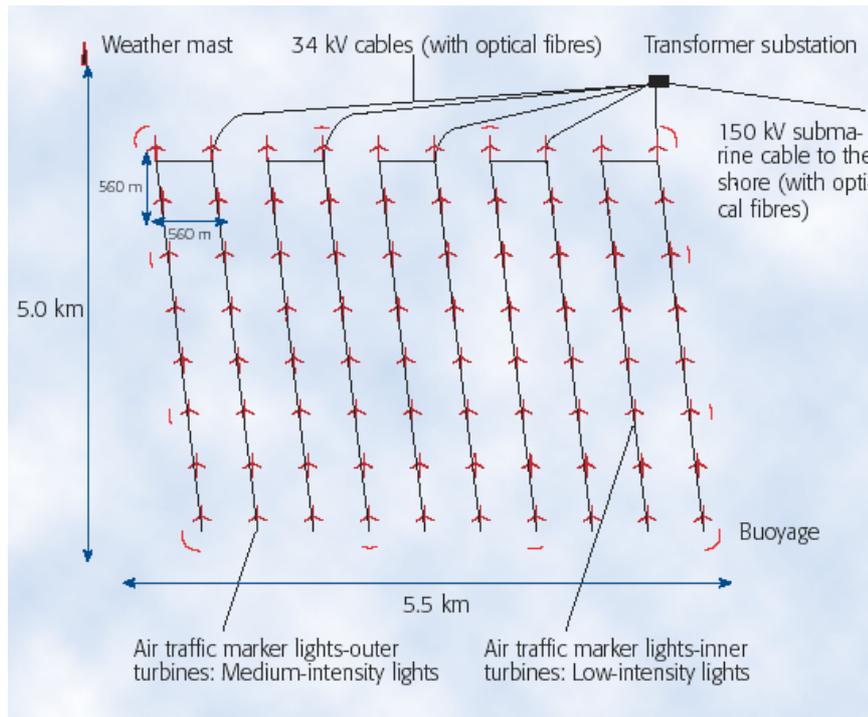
Cabling of Horns Rev wind farm (Source: Elsam).
